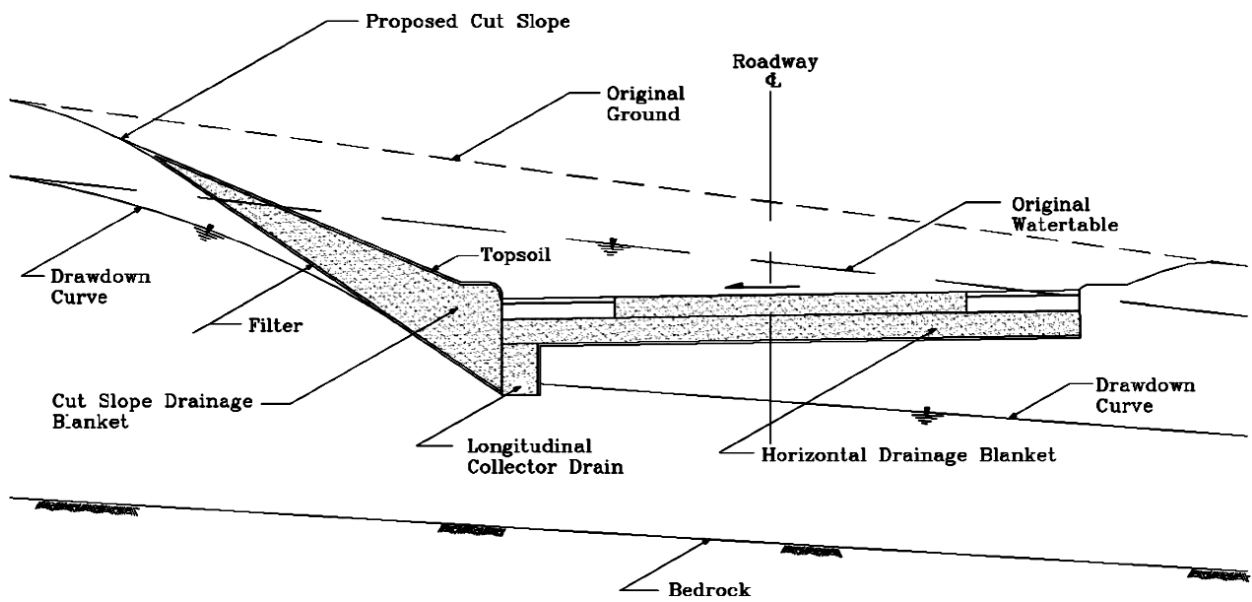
Drainage blanket (wedge) on cut slope drained by longitudinal collector drain (redrawn from Moulton, 1980).
